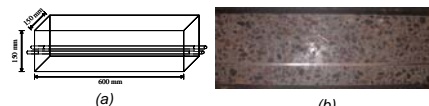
Reinforced Concrete Laboratory Specimen (a) Geometry and (b) Exposed Steel
